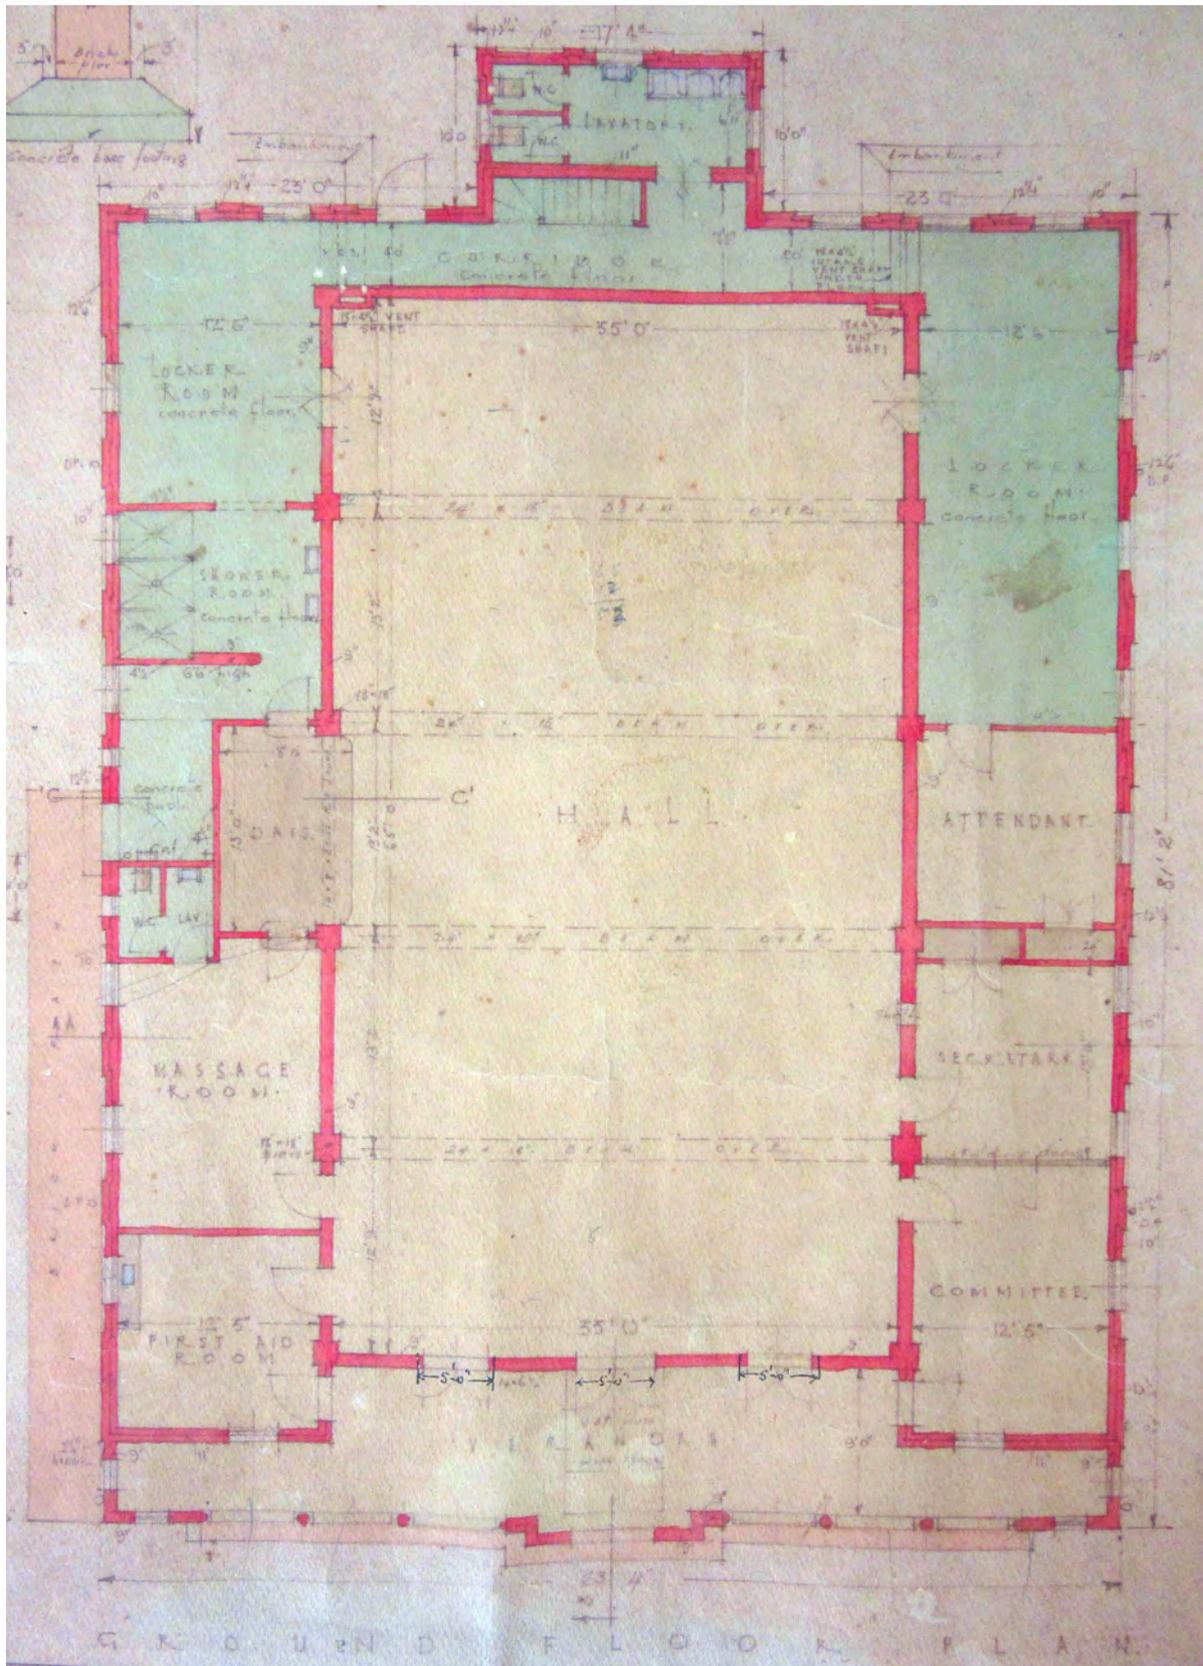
The ground floor plan shows the rooms similar to the plan Index No 432616 but that plan has a side passage that was not built. Instead the attendants room and cupboards were built as shown on this plan. Note the colours are the standard drawing convention, green indicates concrete flooring to the wet areas, red indicates brick and yellow indicates timber. Source: Waverley Council Index No 432619
